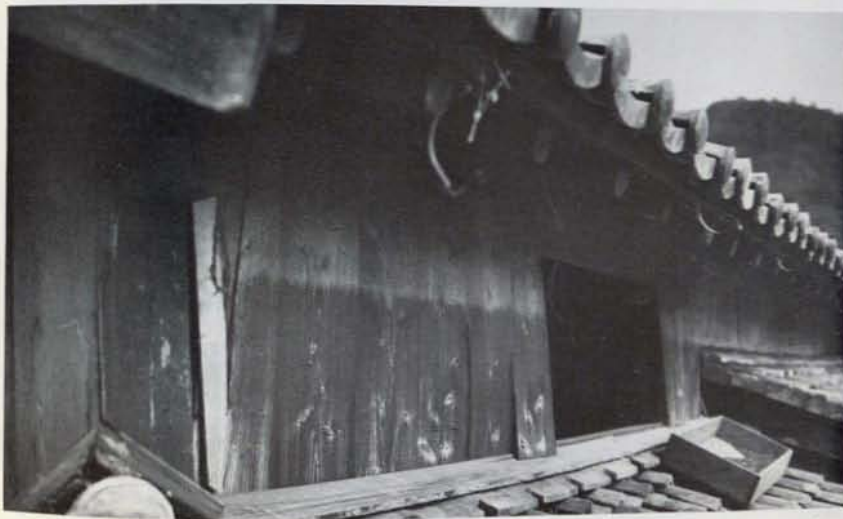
Burns on unpainted wooden siding of Japanese house approximately 7,880 feet north of GZ. Light area above burned wood was shaded by overhanging eaves from heat of atomic bomb.
